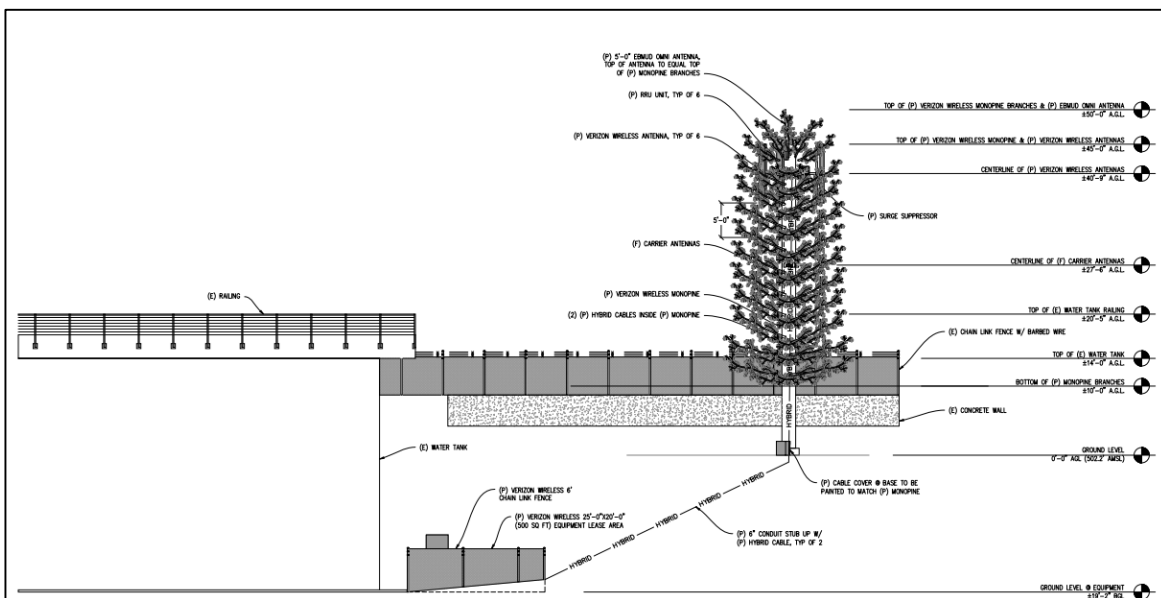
East elevation of panel antennas (Source: Plans, Page A-5).
